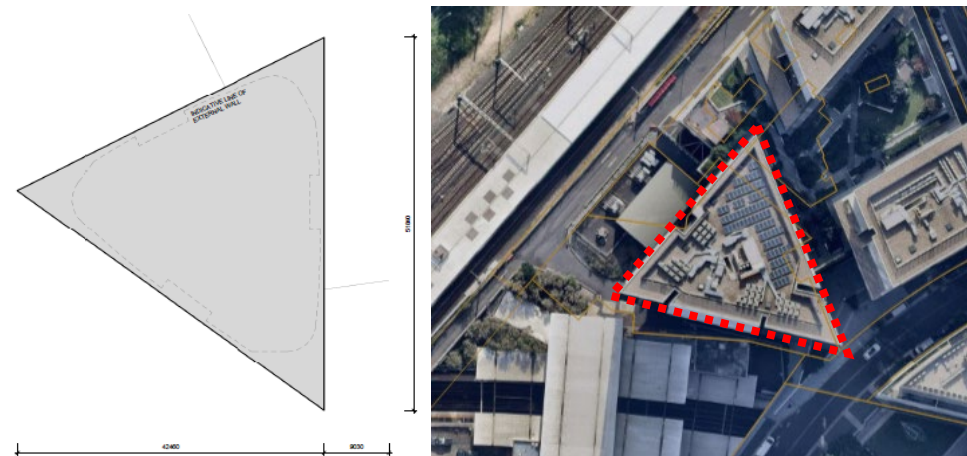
Icon – Approved building envelope (left); Existing building outlined in red (right)
